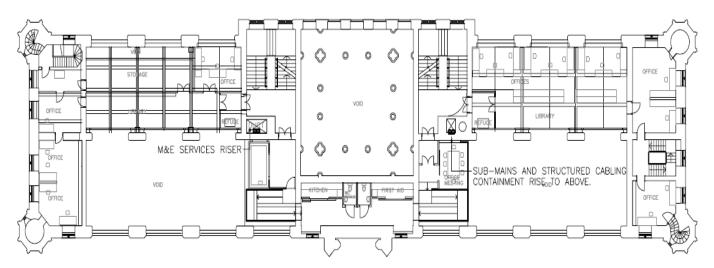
Mezzanine Floor Plan (Source: Page\Park Architects)
